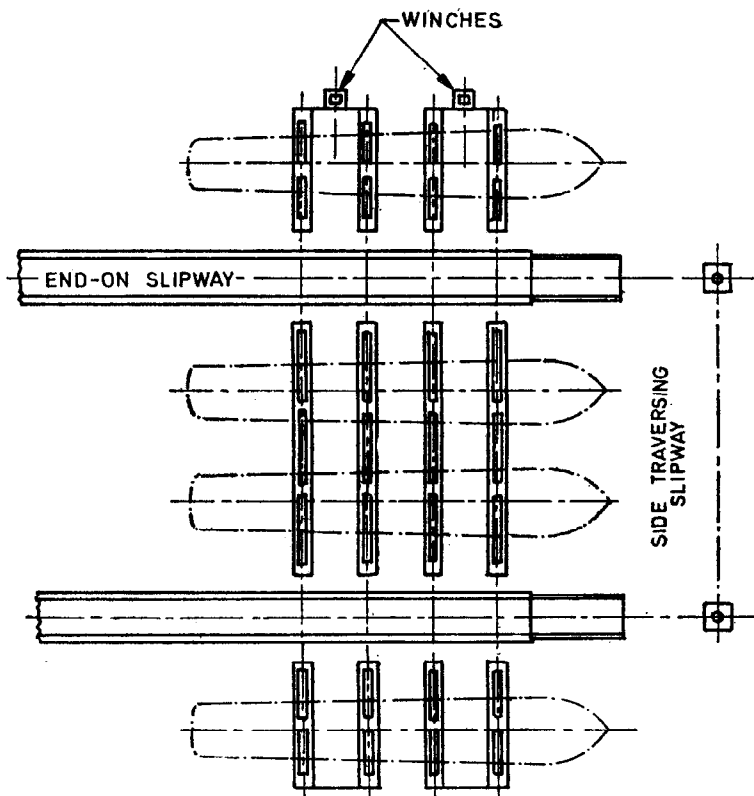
LAYOUT OF SIDE-TRAVERSING SLIP
